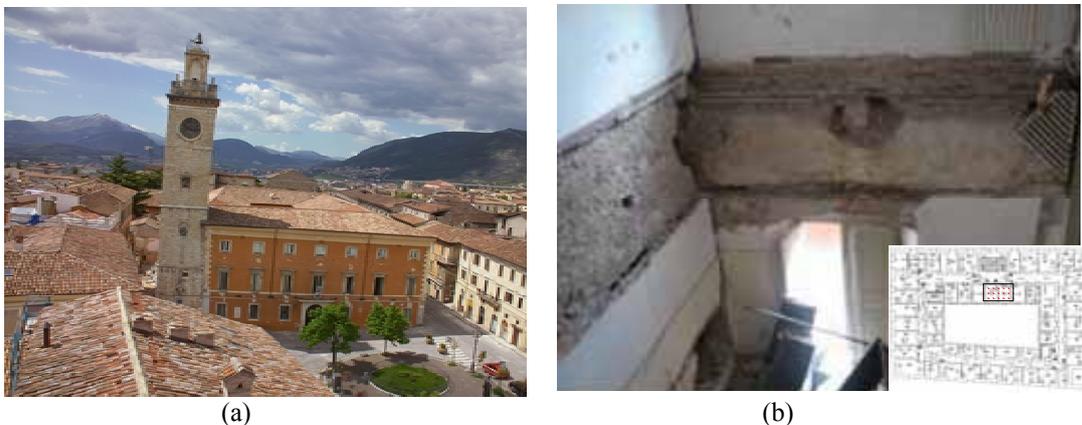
(a) L'Aquila City Hall after April 6th 2009 earthquake; (b) collapse of the floor slab
